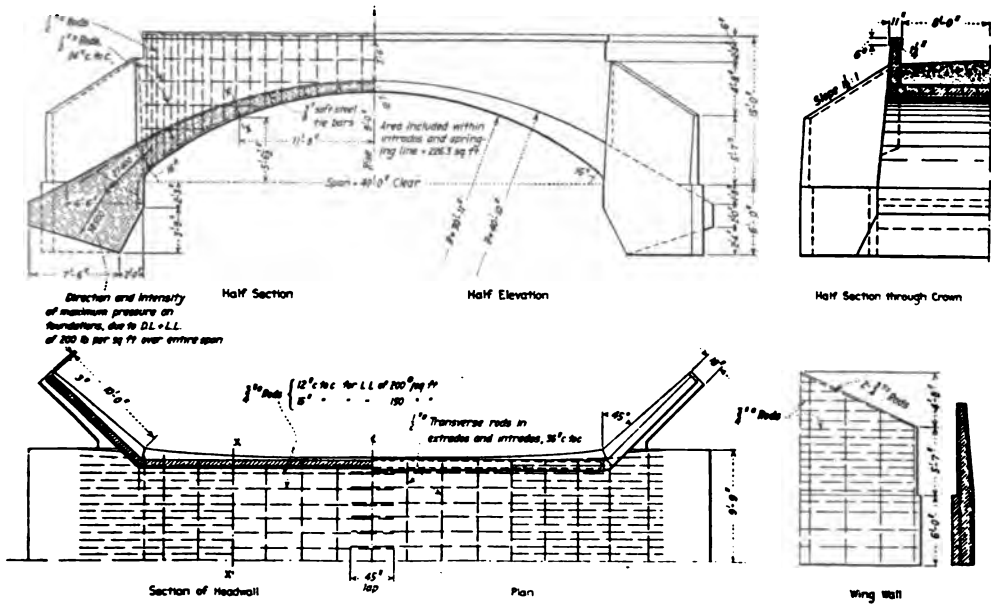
Standard 40-ft. arch, State of Missouri Highway Department.
